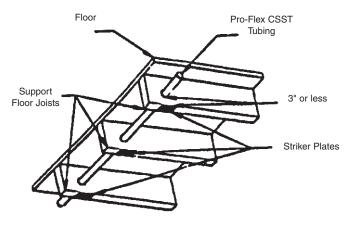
CSST Tubing Going Thru Joists Within 3" of Potential Nailing Surface.
